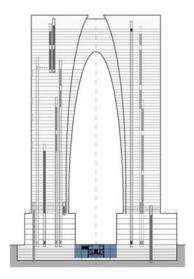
24 The Orient Gate underground complex: commercial basement + subterranean station + metro tunnel (total floor space: 500,000 square meters)
